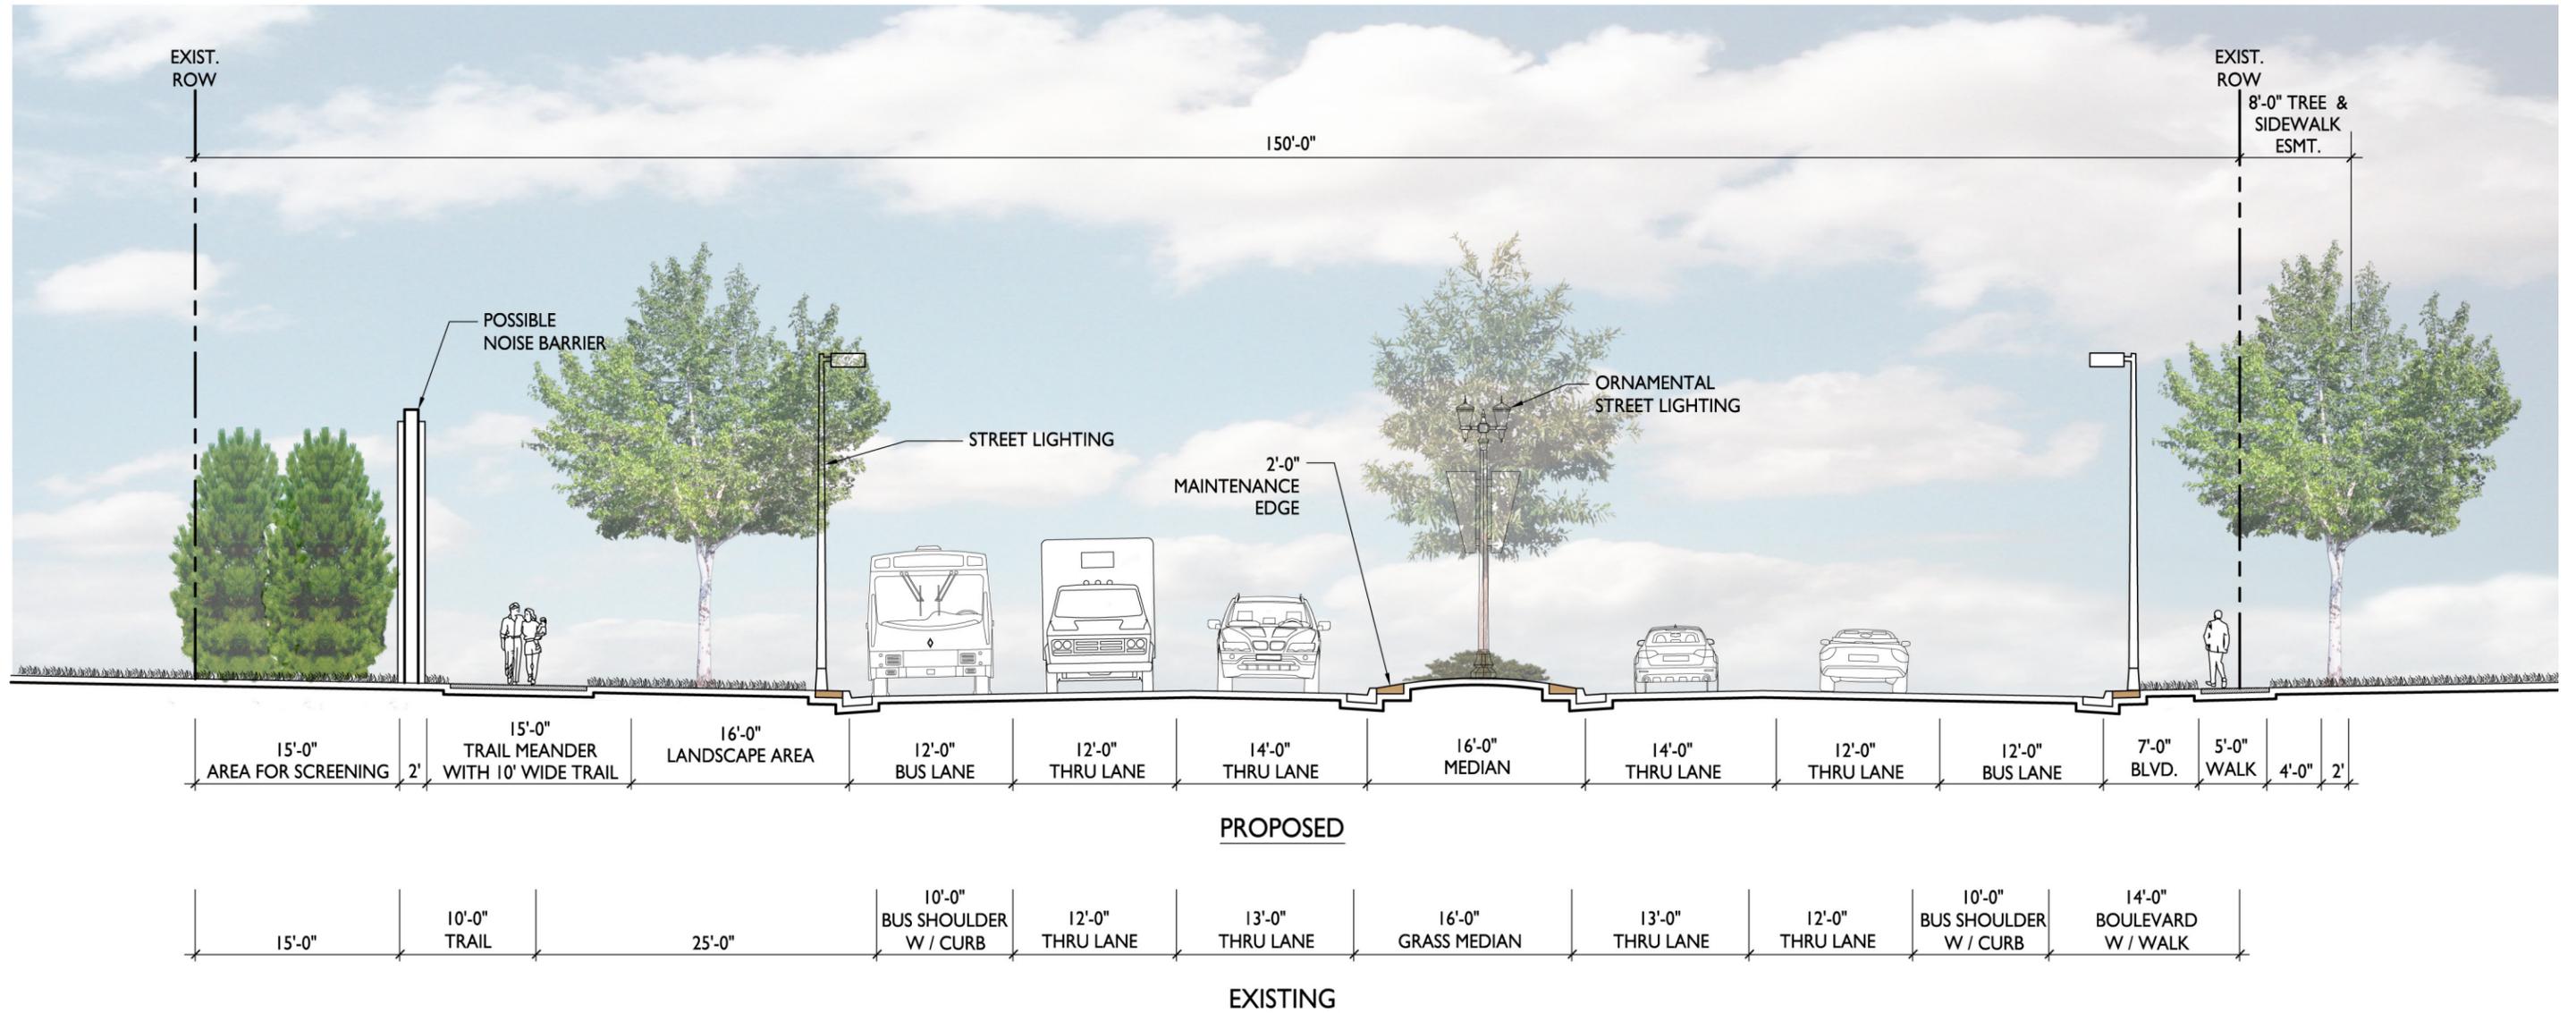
Proposed Roadway Recommendations Overview
